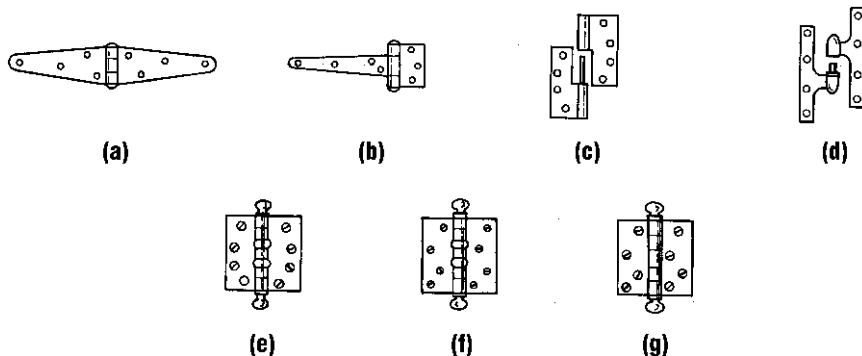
Typical hinges and butts; (a) heavy strap hinge; (b) heavy T hinge; (c) loose-joint hinge; (d) olive knuckle hinge; (e) bearing template hinge; (f) bearing nontemplate hinge; (g) plain bearing nontemplate hinge.
